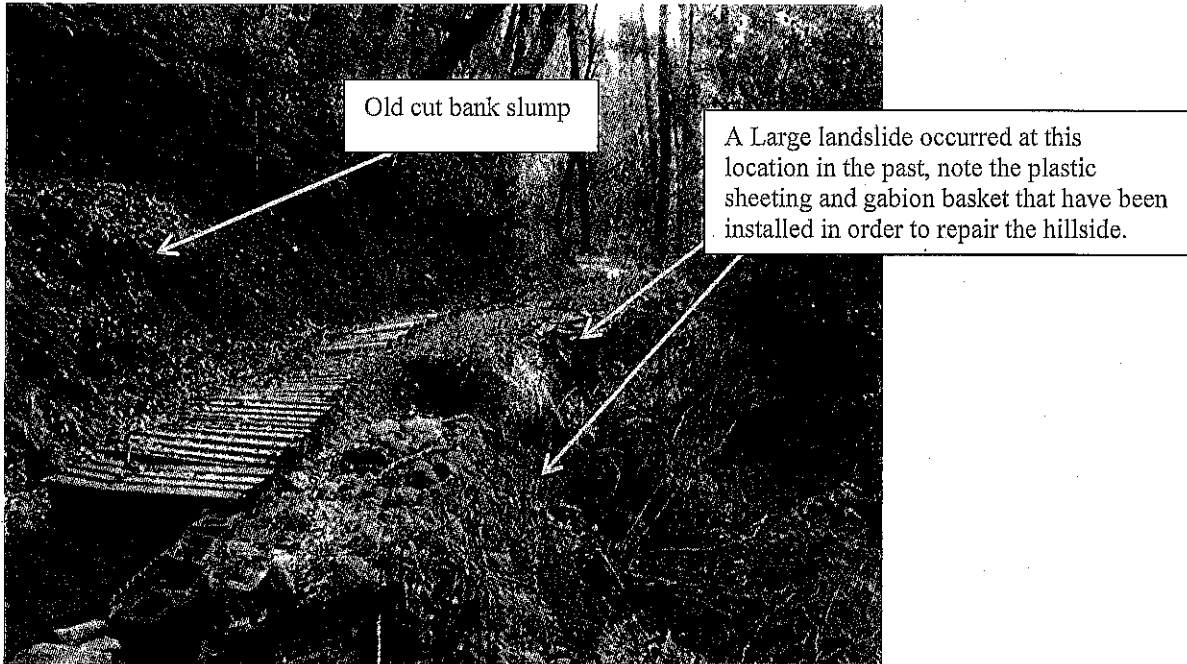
Large landslide caused by cut bank slump damming ditch and redirecting diverted flow downhill..
